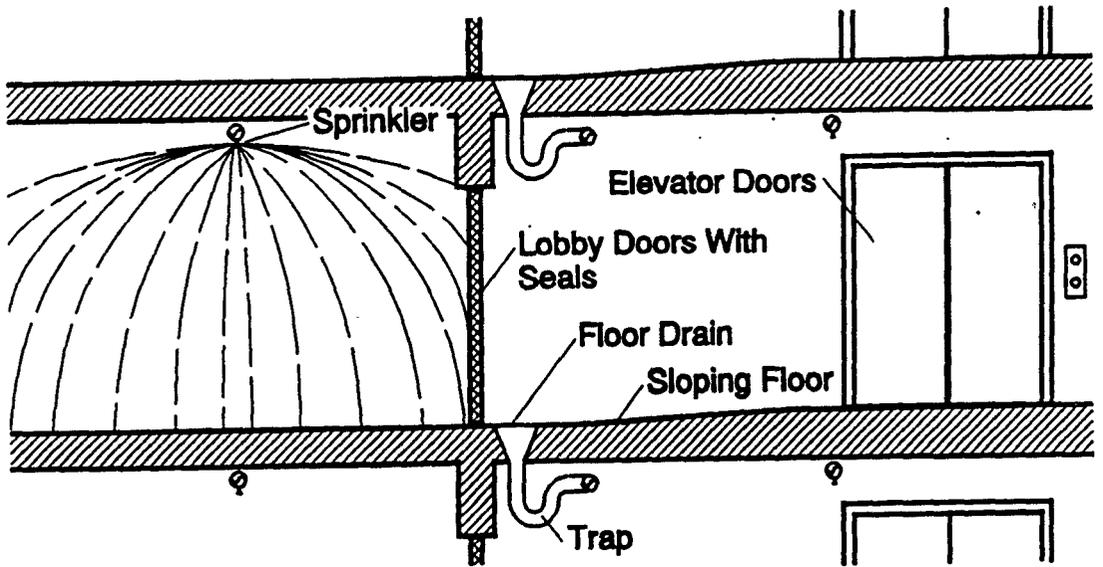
Conceptual use of sloping floors, floor drains and doors with seals in an effort to prevent water flow into hoistway
